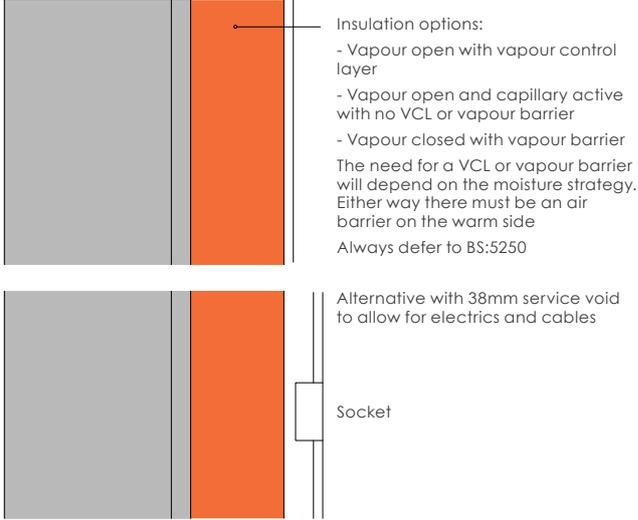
Insulation strategy for solid wall - internal wall insulation (IWI)
